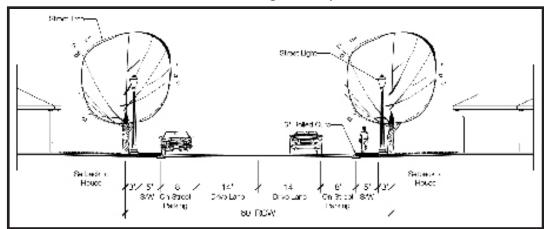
Residential Collector - Union Ranch East, Section I
